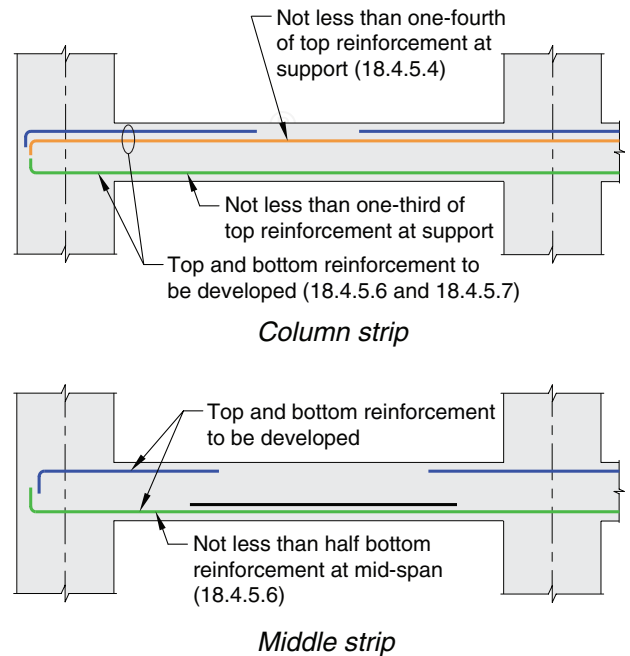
Arrangement of reinforcement in slabs.
